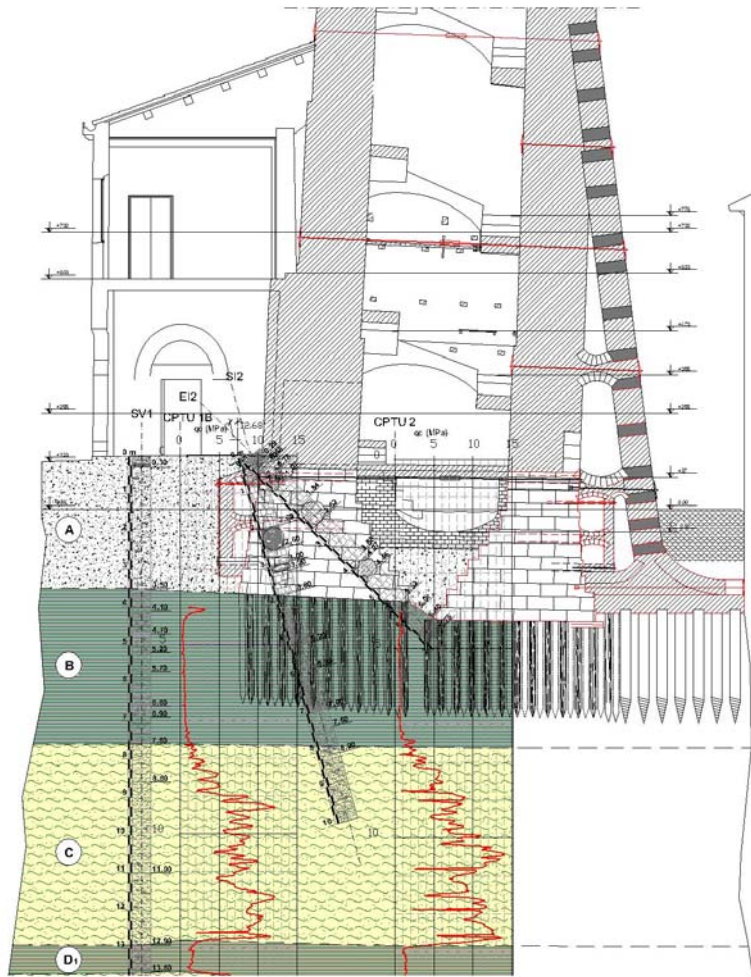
Schematic section of the tower foundation and of the relevant subsoil (AA in Figure 1.12).
